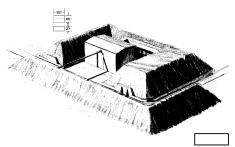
POSSIBLE BATCH MIX/INGREDIENT PREPARATION BUILDING (item 1, Figure 3).
